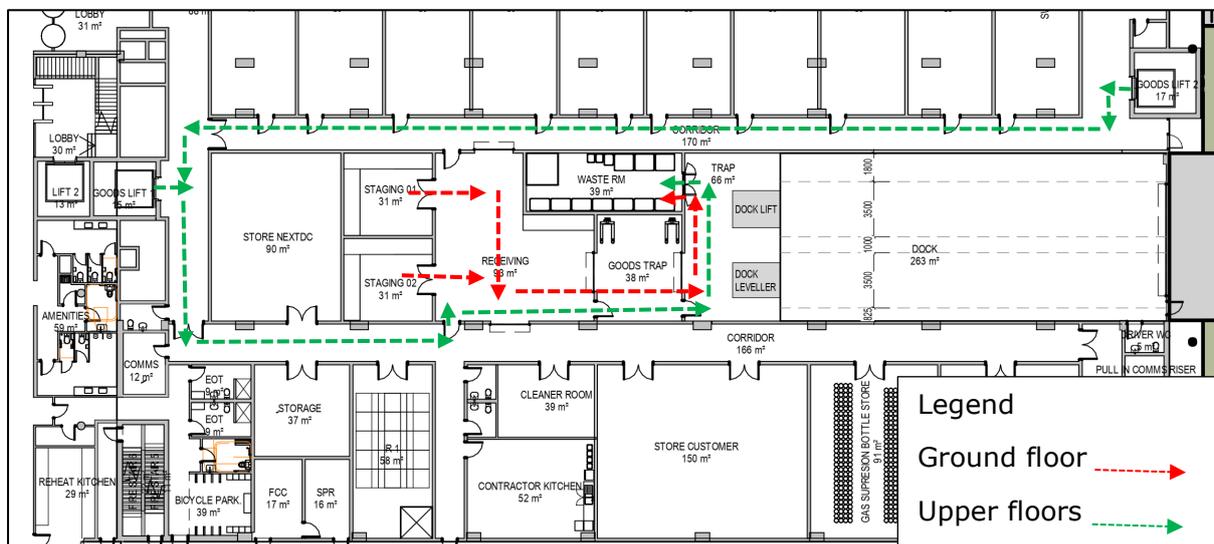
Building A - Internal transfer of waste and recycling from ground floor and upper floors
